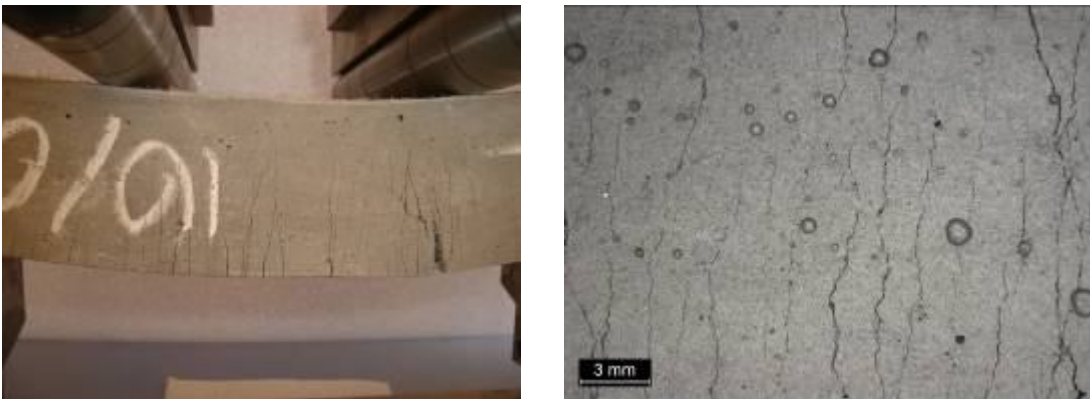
Typical cracking patterns of ECC beam specimen after flexure load applications (Mix ID.: FA1.2_0.55_1000)
